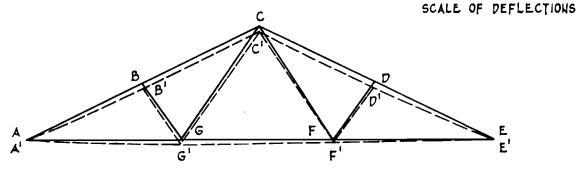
DEAD LOAD + CEILING LOAD + 1/2 LIVE LOAD
